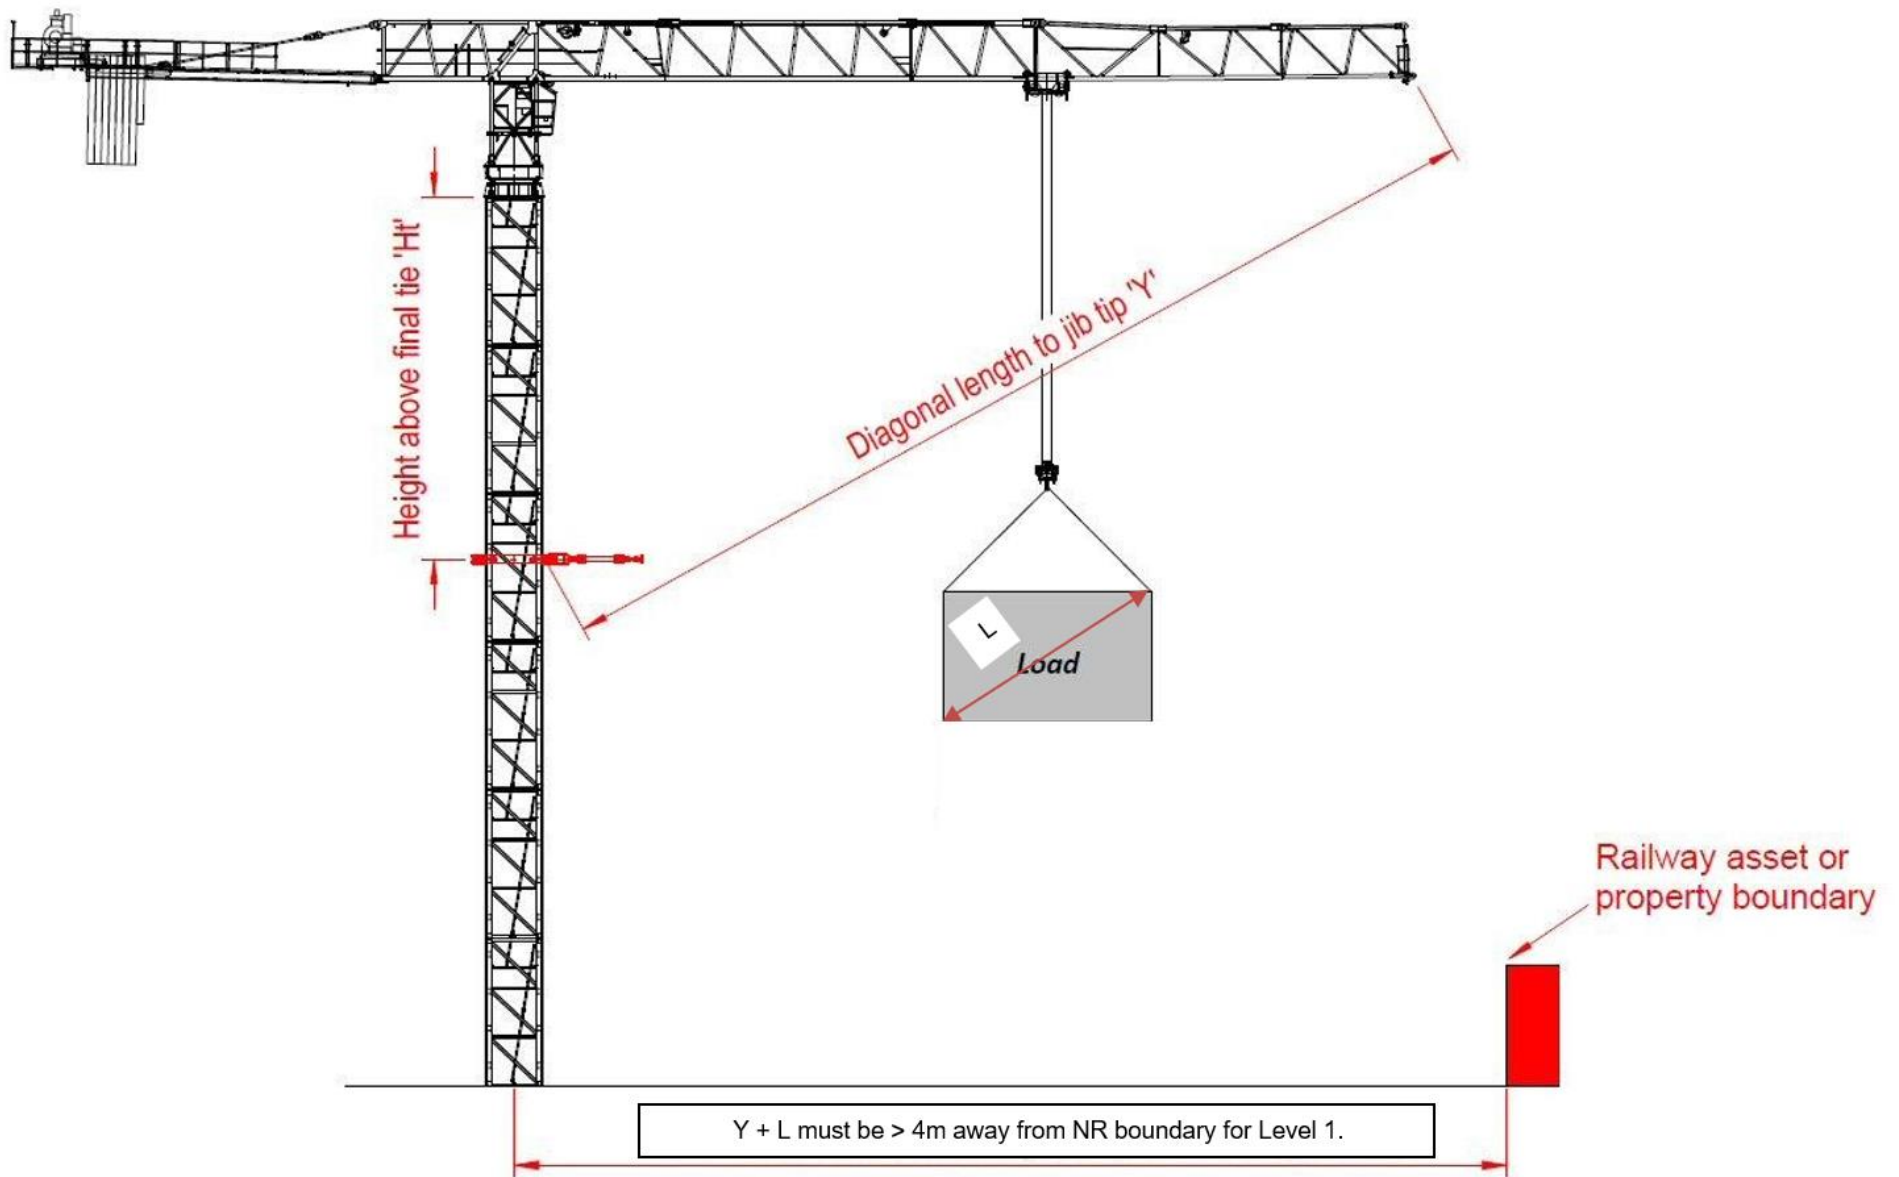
Collapse Distance When Tied to an Adjacent Structure
